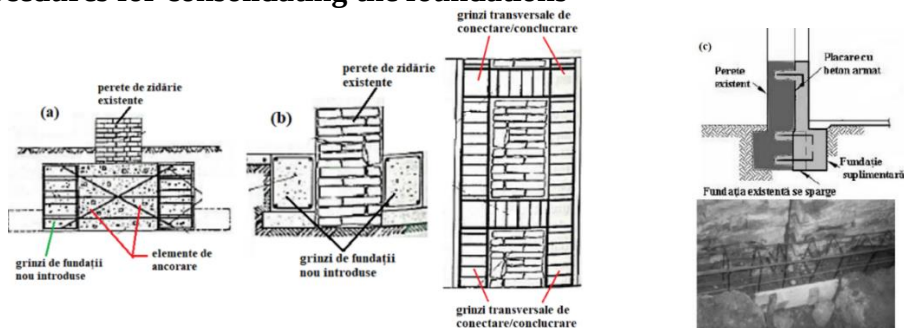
a), b) Consolidation of foundations by widening their base in solutions; c) Reinforcement of foundations by reinforced concrete cladding [1, 97]
